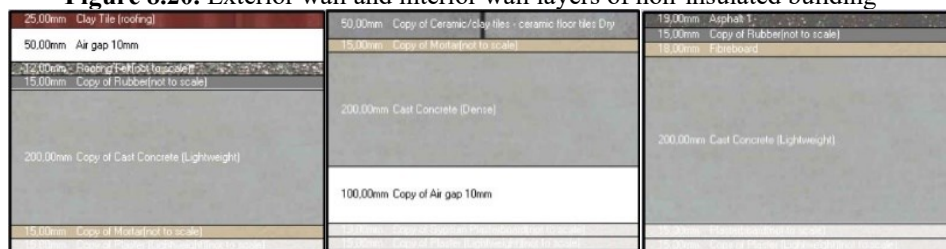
Roof, ceiling and floor material layers of non-insulated building
